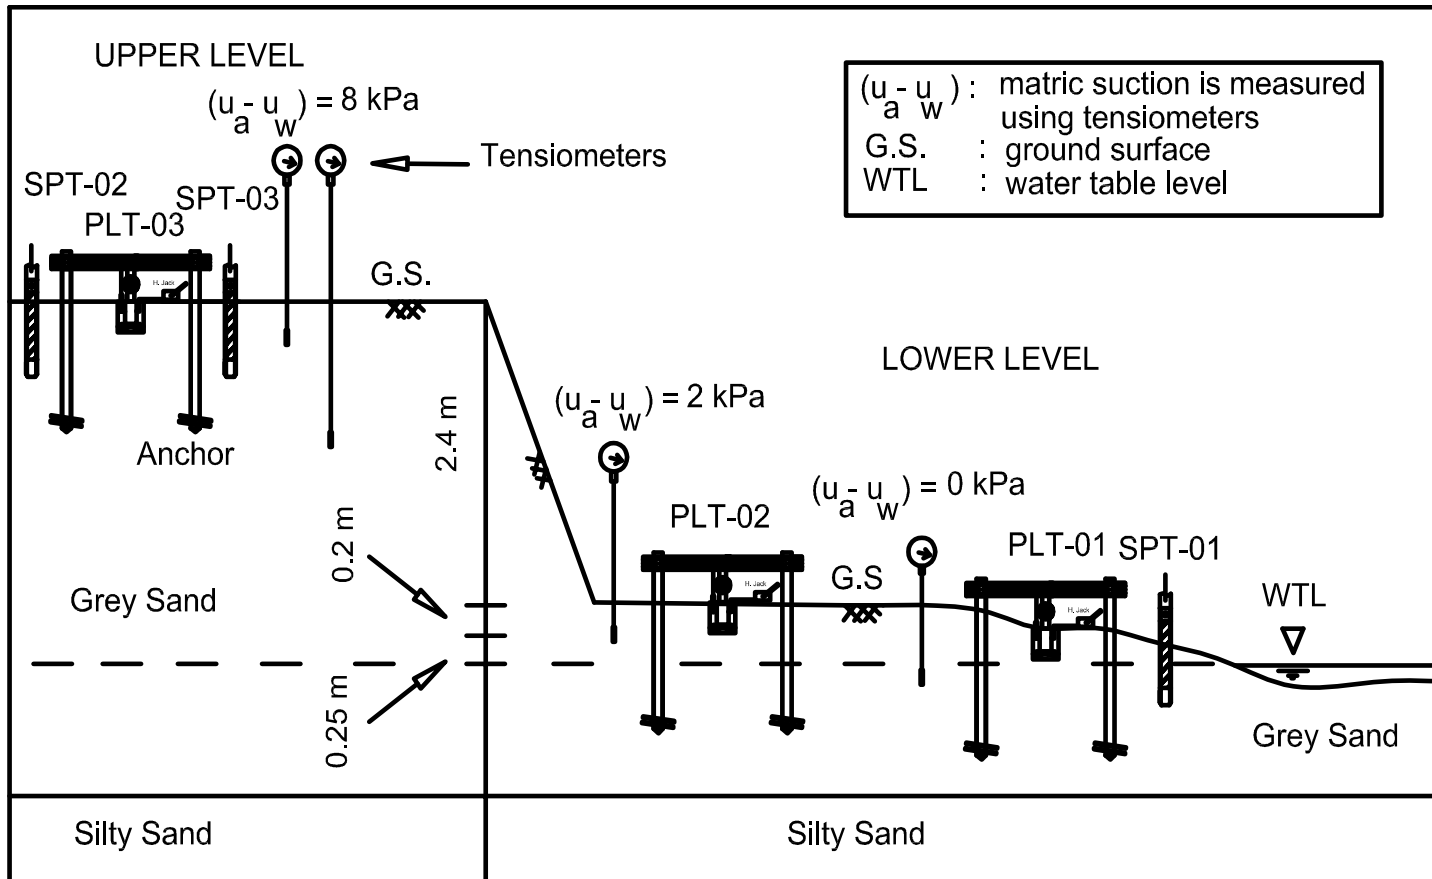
Sectional view of the test site with details of SPTs and PLTs locations
